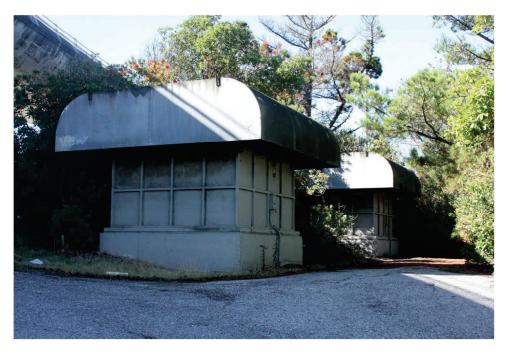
92-280 Tunnel (South Connector Undercrossing) ventilators
